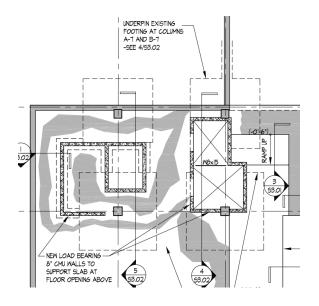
Location of new elevator pit and foundation underpinning shown in plan, S1.01
